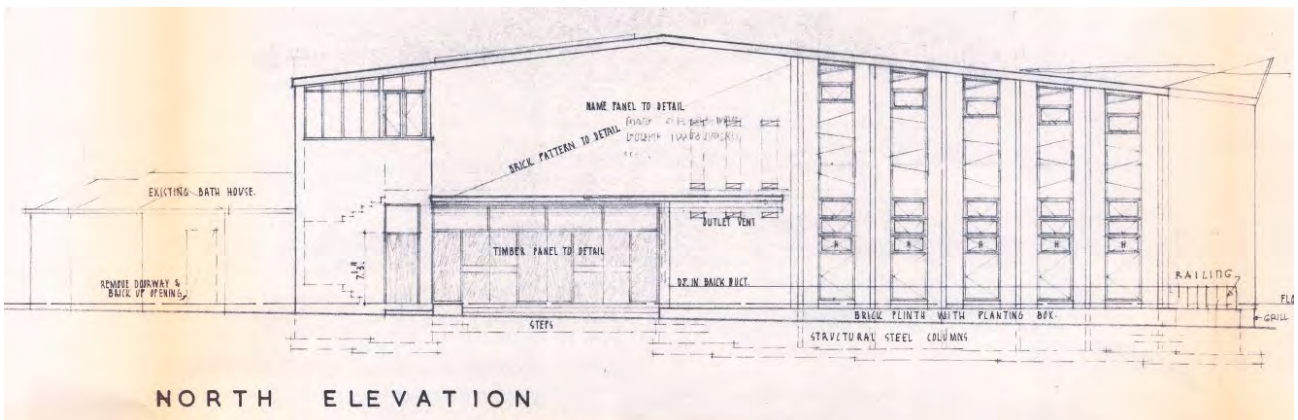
Drawing dated November 1964, (Dr. Ernest Fooks), showing north elevation. Stamped 13 December 1964 in relation to permit no. 602. (Source: Council Building File)
